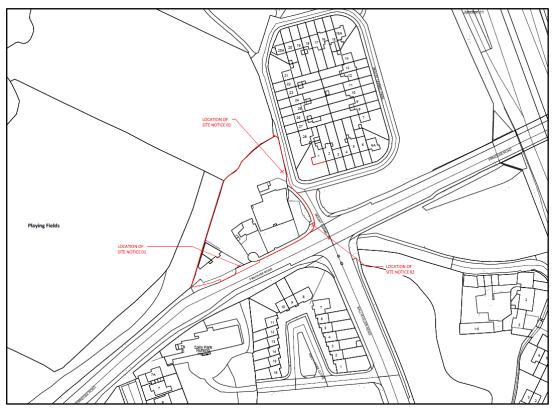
Extract from the Site Location Plan, prepared by OMP Architects
